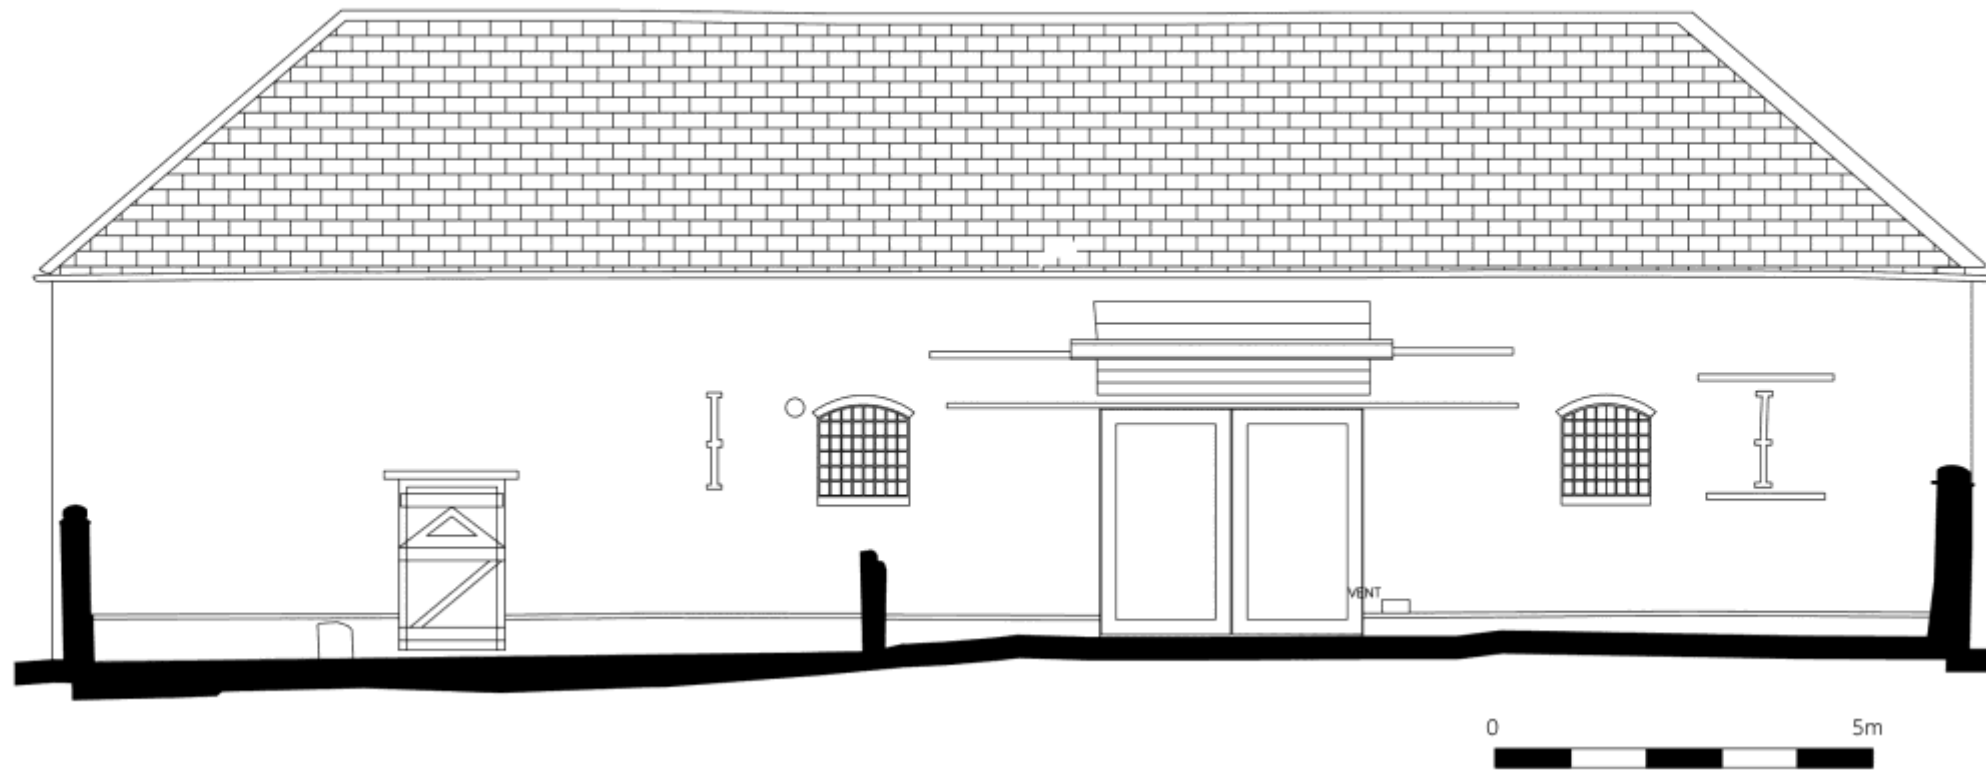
Cart shed proposed mezzanine floor (scale 1:100)
